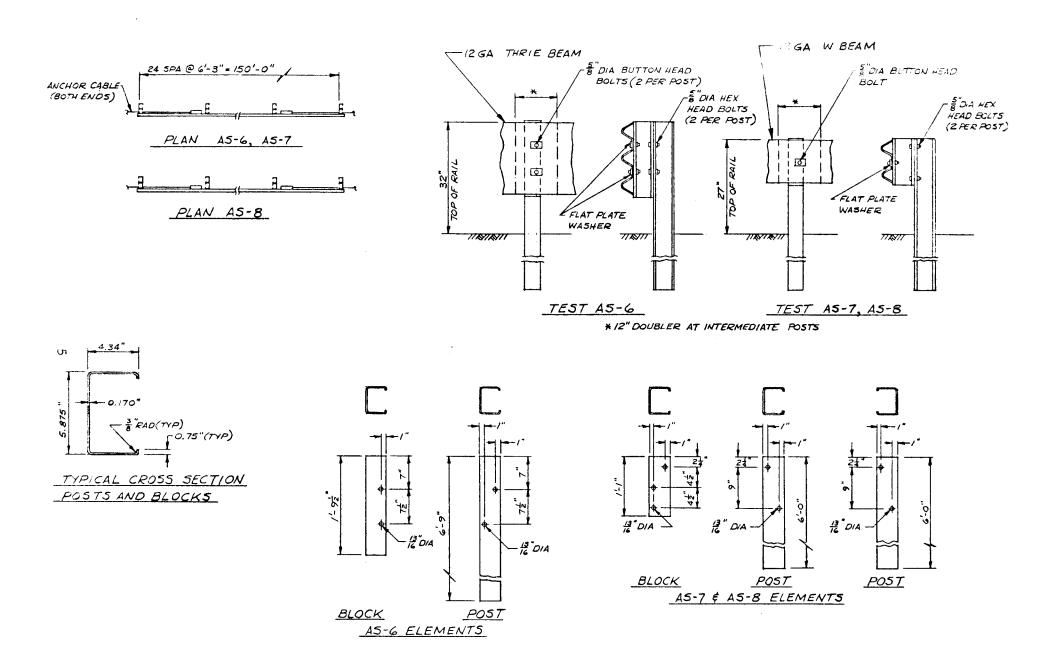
TEST AS-6, -7, AND -8 INSTALLATION DRAWING
